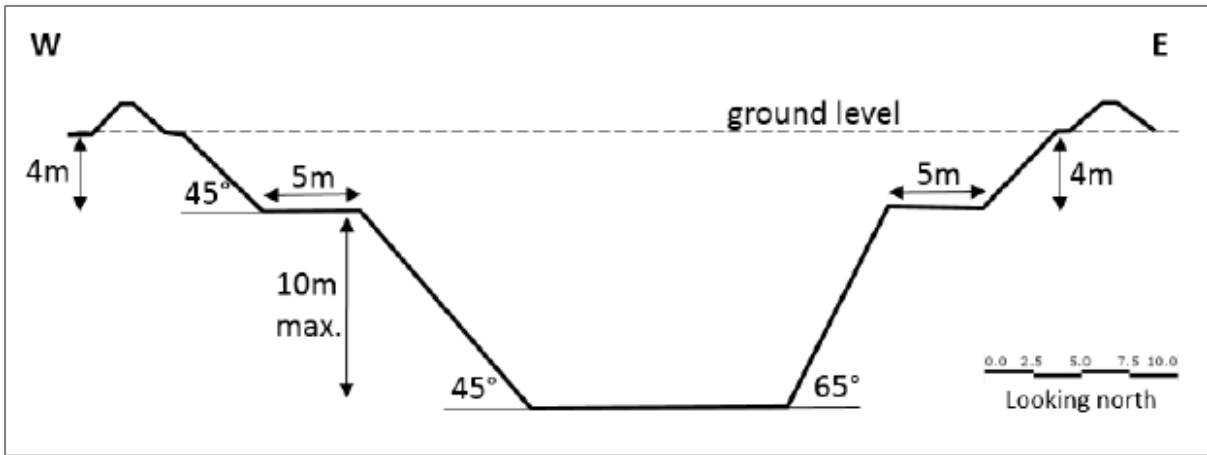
| CROSS SECTION OF PROPOSED BOXCUT SHOWING BENCH ANGLES AS DETERMINED FROM GEOTECHNICAL INVESTIGATIONS (FIGURE FROM APPENDIX M1)
